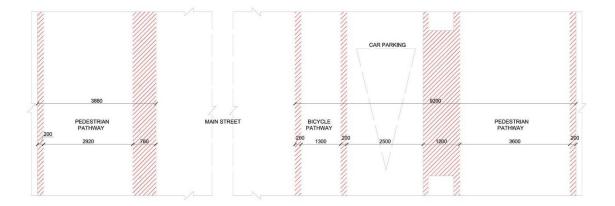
Street width and buffer spaces (in mm) for Gateway 10 in the area surrounding Hauptwache in Frankfurt am Main
